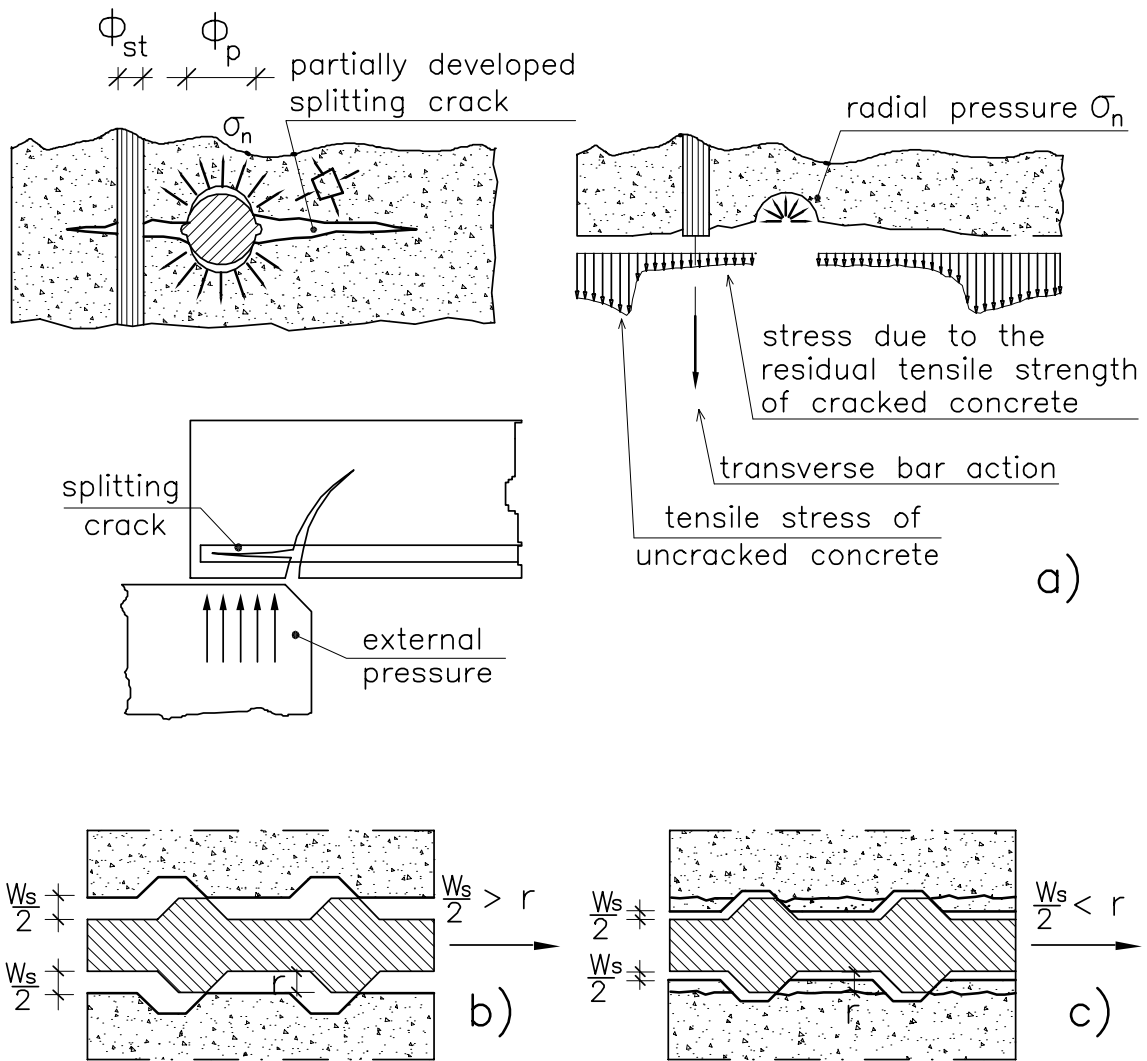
Splitting crack and confining actions around a ribbed bar [11] (a); scheme of local bond failure: “pull-out failure” (b) and “splitting failure” (c) [31].
